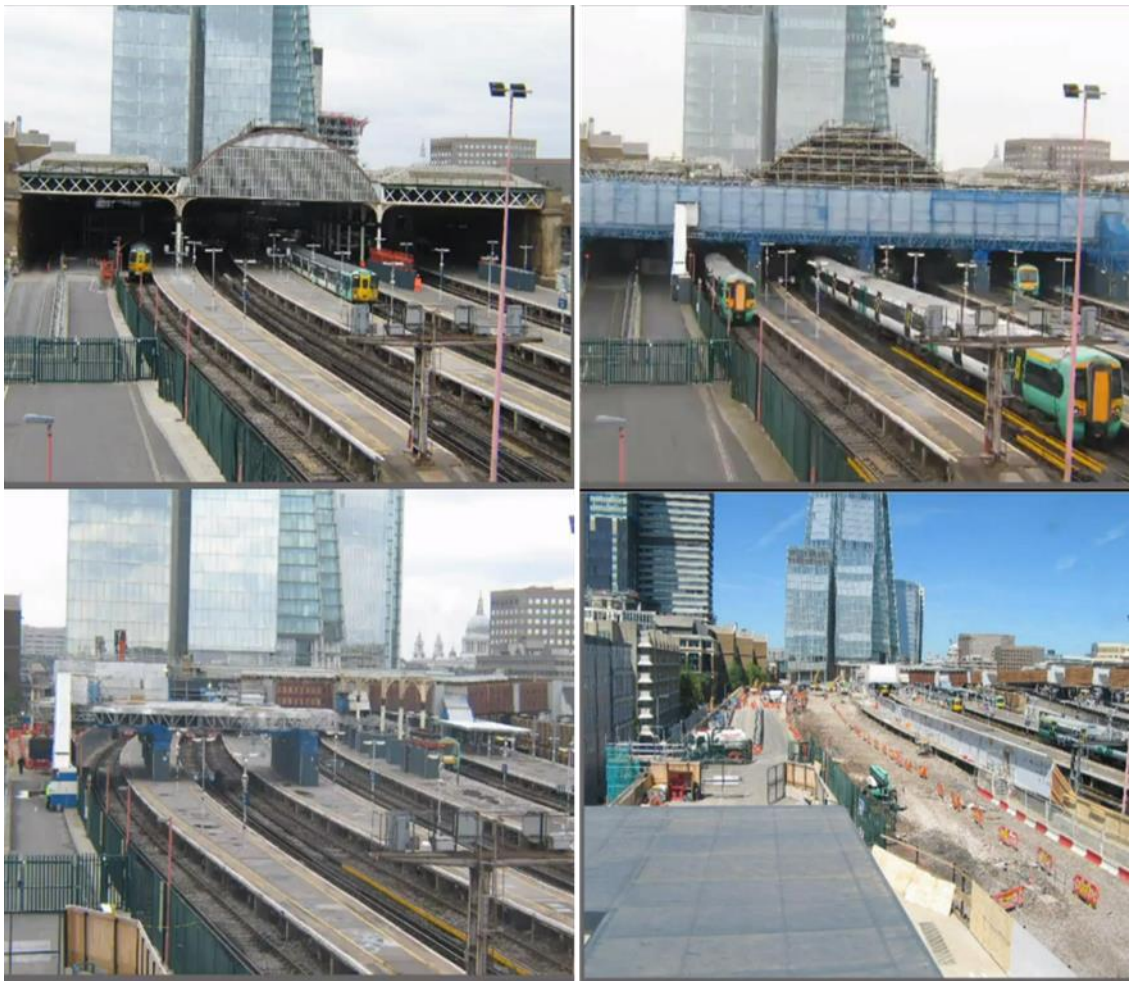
London Bridge Station undergoing major redevelopment (time-lapse images taken from the London Bridge Site-Eye camera)
